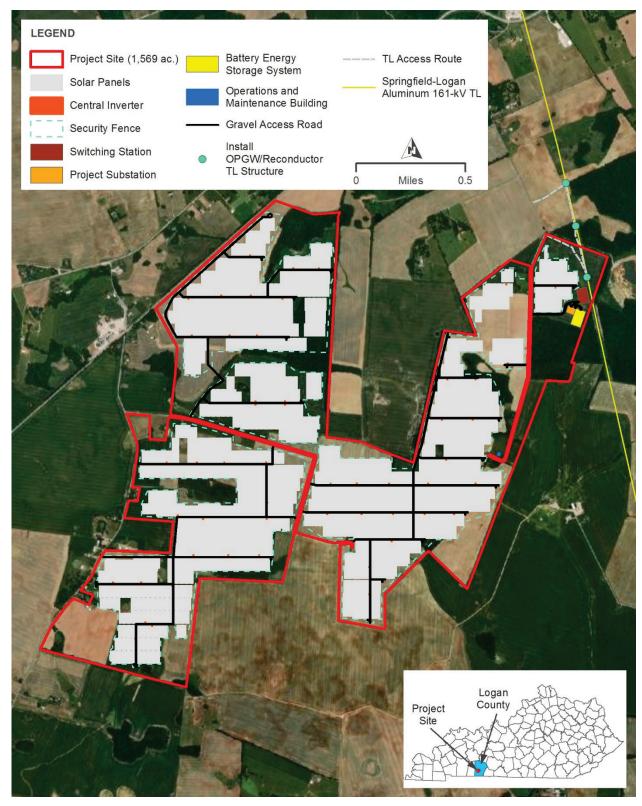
Aerial photo showing the proposed layout of the Logan County Solar facility components
